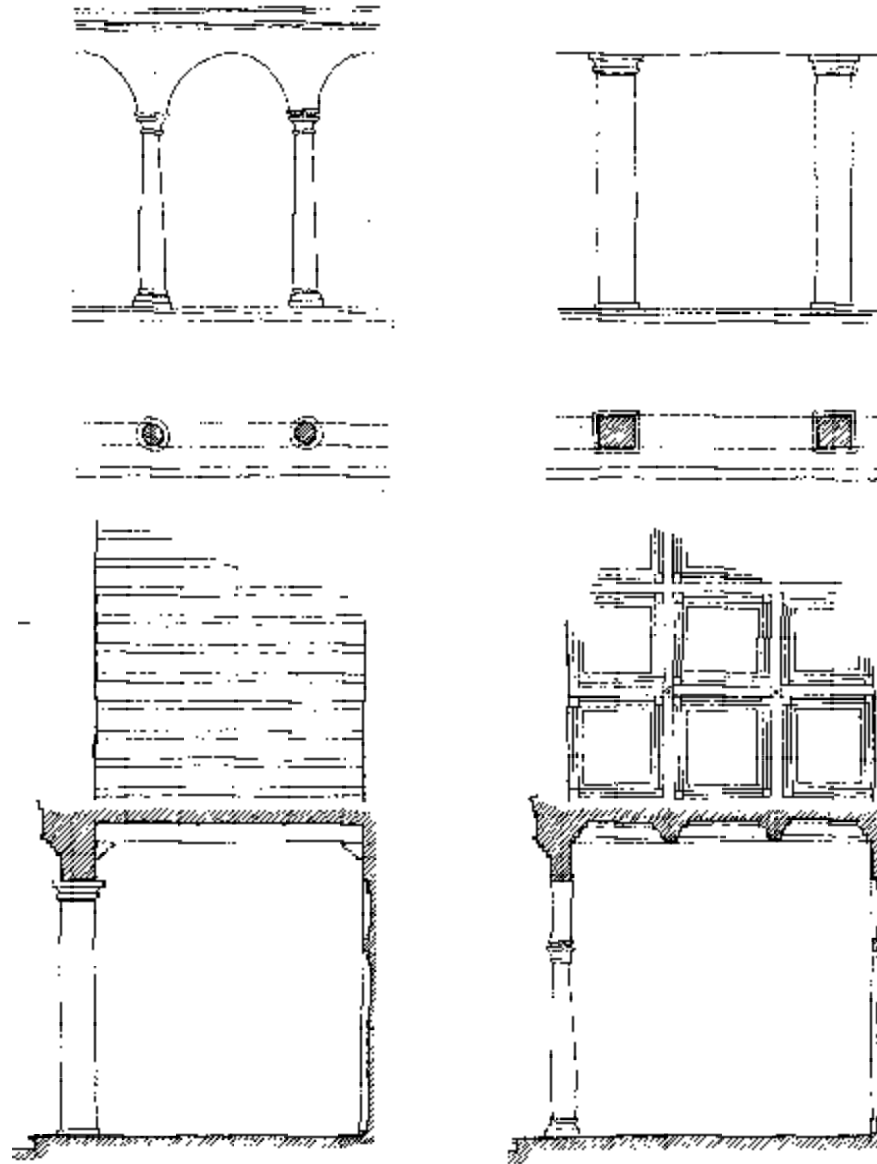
LOGGIAS & ARCADES shown with alternative details.
